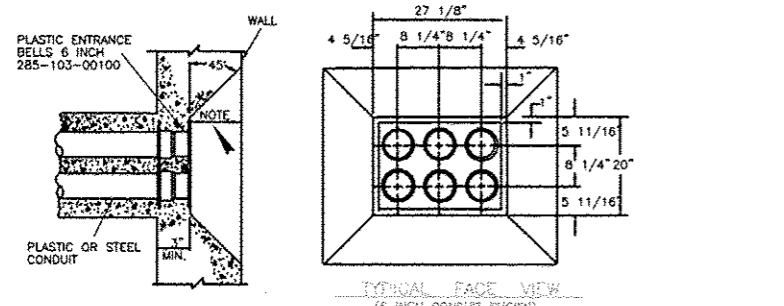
MANHOLE ENTRANCE WITH PLASTIC TERMINATORS (OLDER STYLE) FOR PLASTIC OR STEEL CONDUIT (POCKET TYPE)
